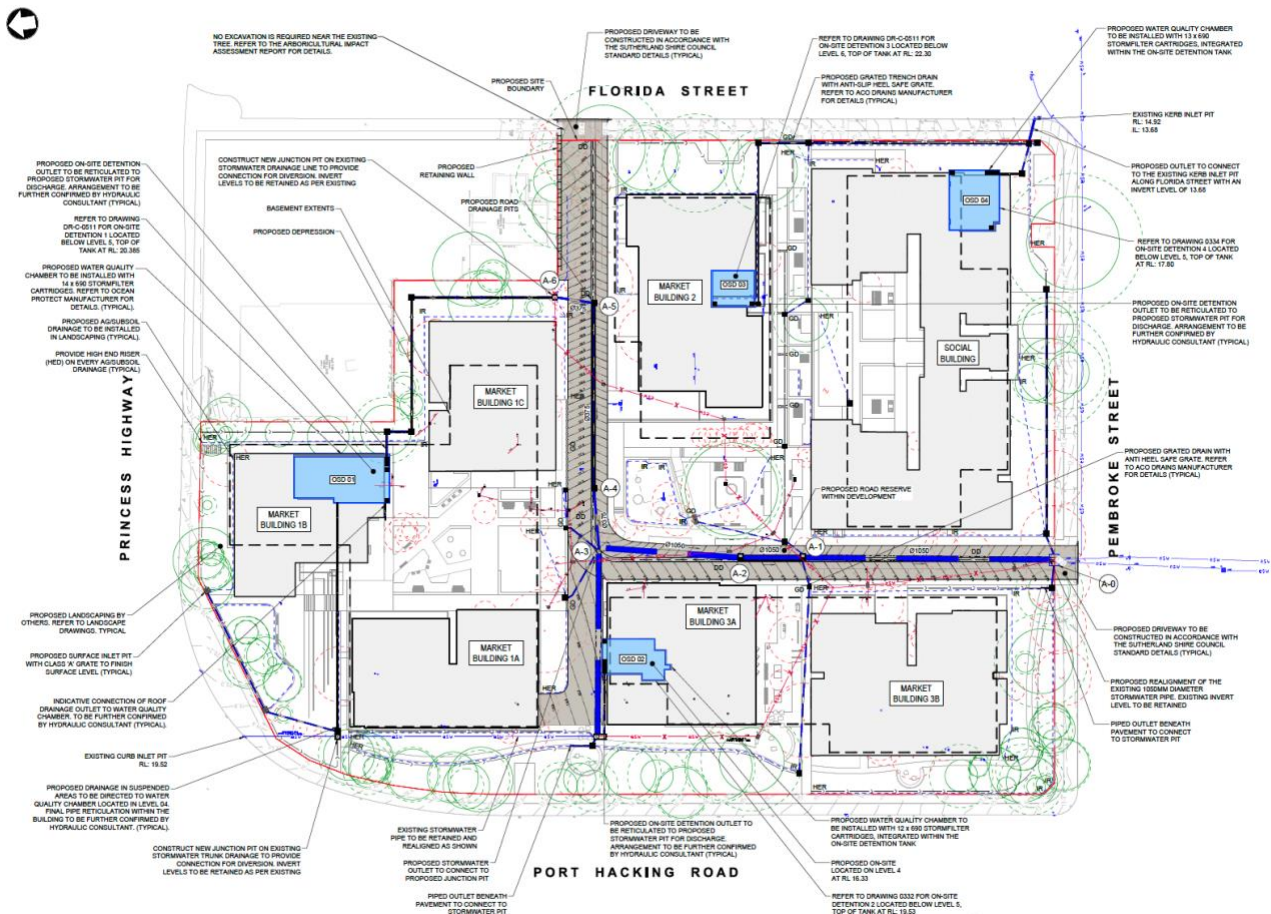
Proposed drainage plan (Source: Mott MacDonald)
